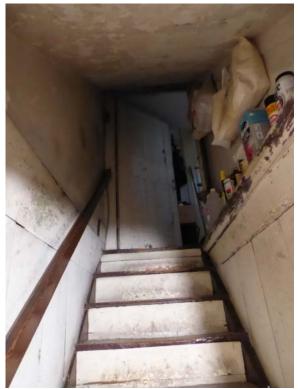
Looking north up basement stairs. Plaster ceiling peeling and stairs worn.
